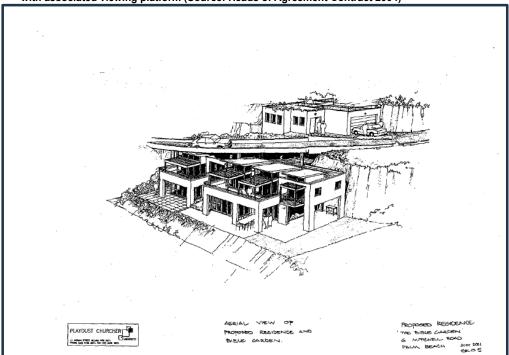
Concept Architectural Plans Detailing location of Garage on southern portion of 6 Mitchell Road with associated viewing platform (Source: Heads of Agreement Contract 2004)
